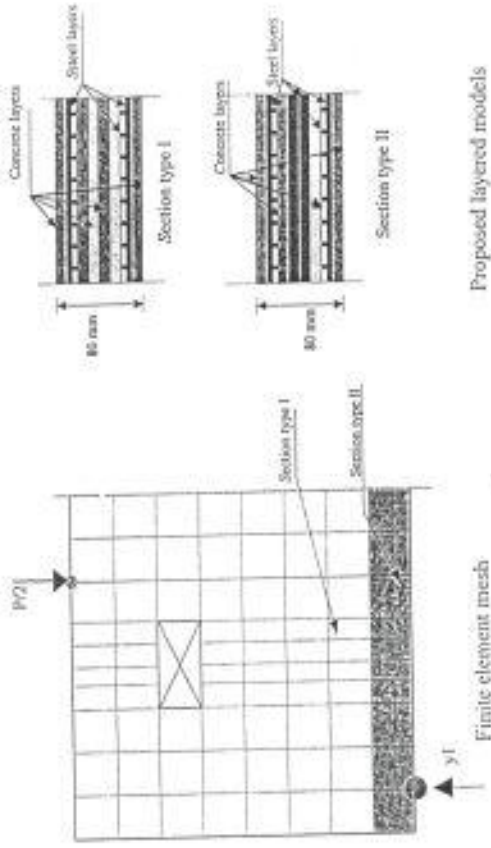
Proposed finite element mesh and layered models of the studied deep beams with web openings (Beam No. 3).
